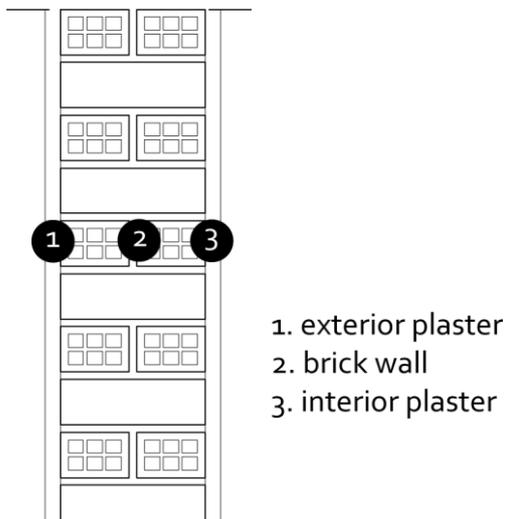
Common practice brick walls - Buildings like MF1, MF2 (161)
